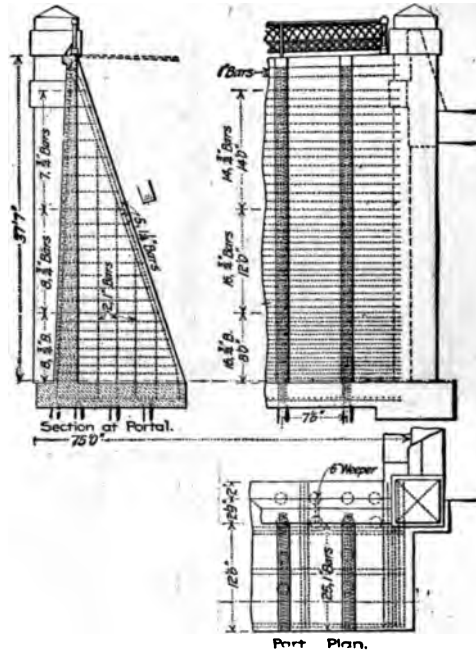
Retaining Wall, Great Northern Ry., Seattle, Wash.
